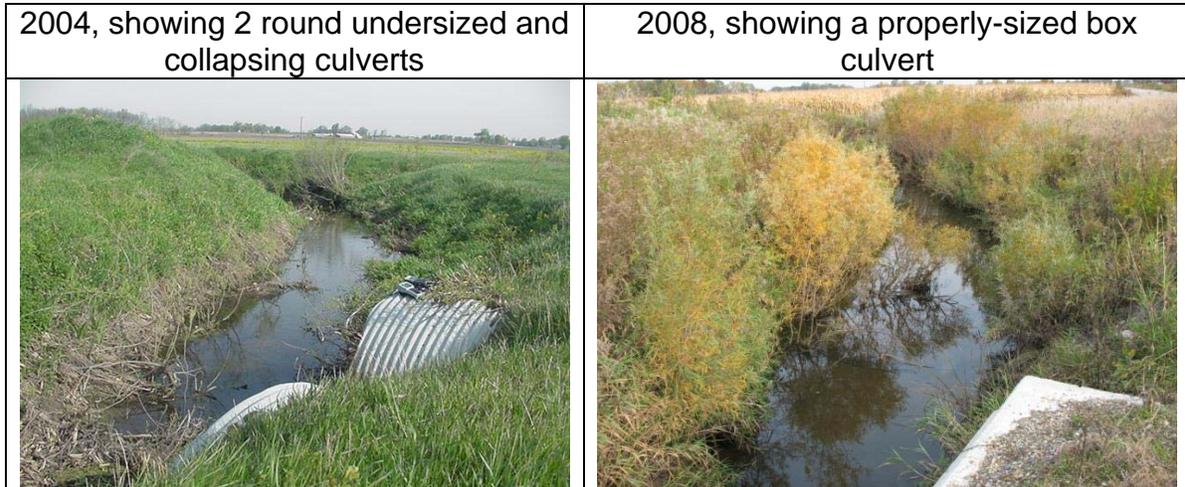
Quincy Street east of 112th Avenue, before and after road resurfacing and bridge replacement.
